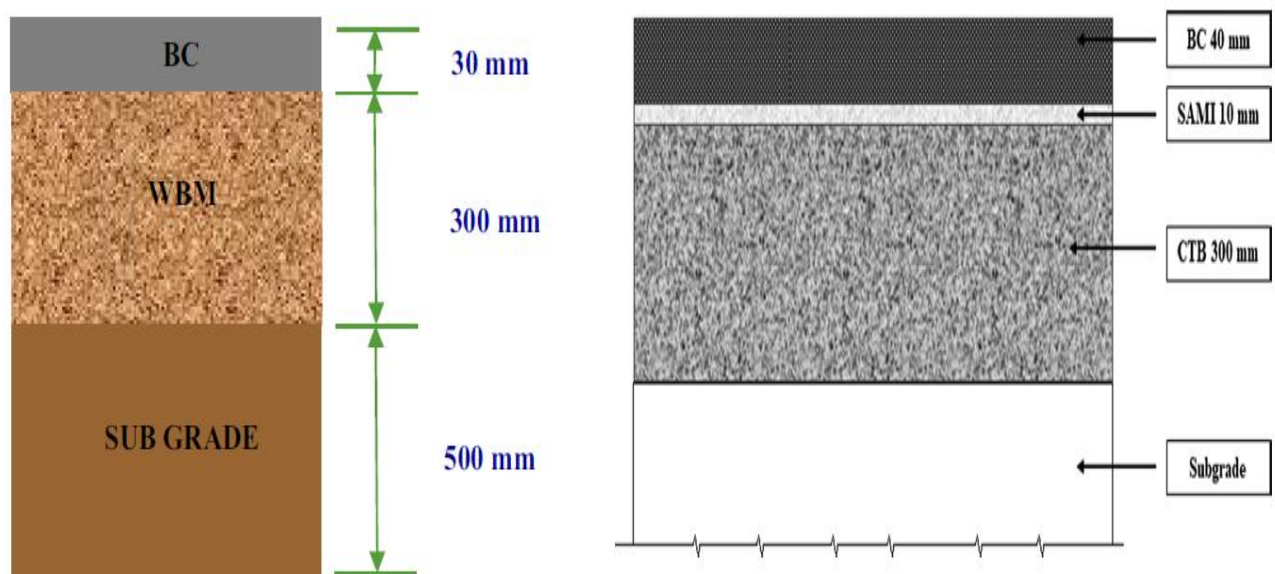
(a) Cross-section of old pavement (b) Detail of new pavement layer.
